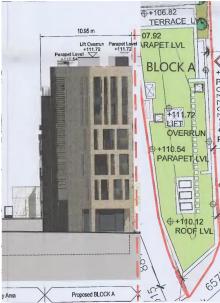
6 STOREY BLOCK A LOCATED HARD UP TO GREENHILLS ROAD SHARED BOUNDARY
